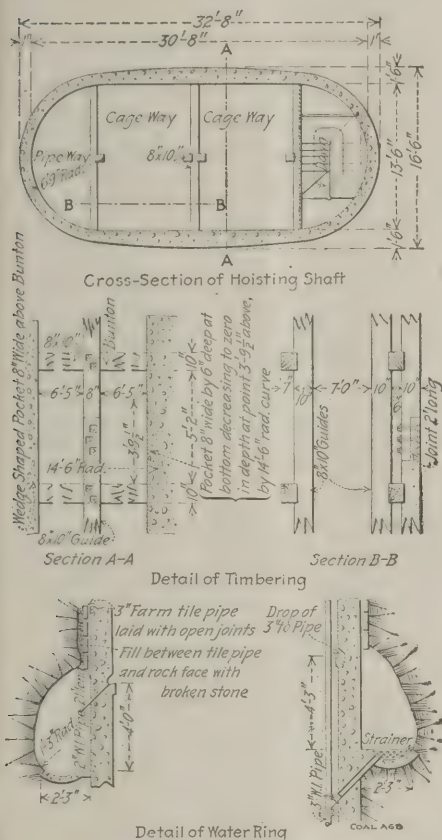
DETAILS OF SHAFT CONSTRUCTION
